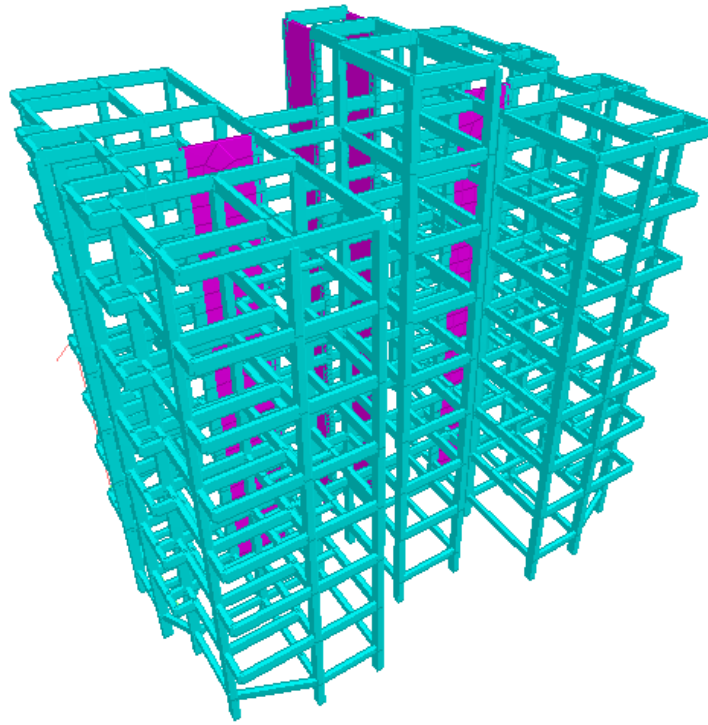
(a): Model 4 – 3D model in StaadPro showing location of Shear Wall
